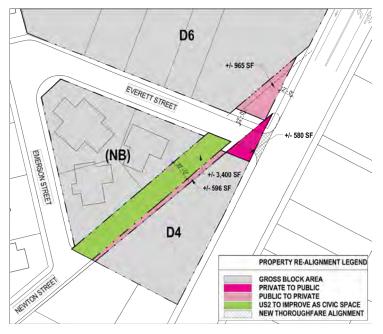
EVERETT AND NEWTON STREET REALIGNMENT
